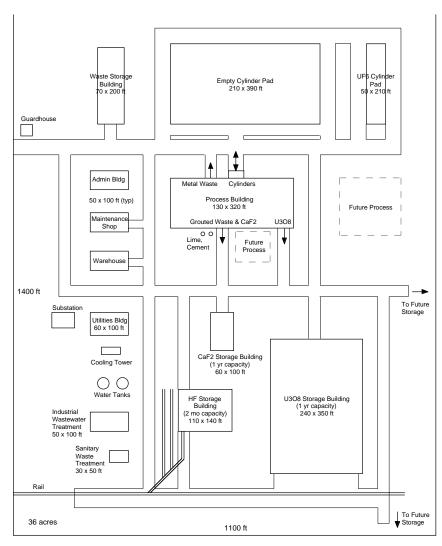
Conversion Facility and Storage Site Plan DUF6 Conversion to U3O8 and AHF
